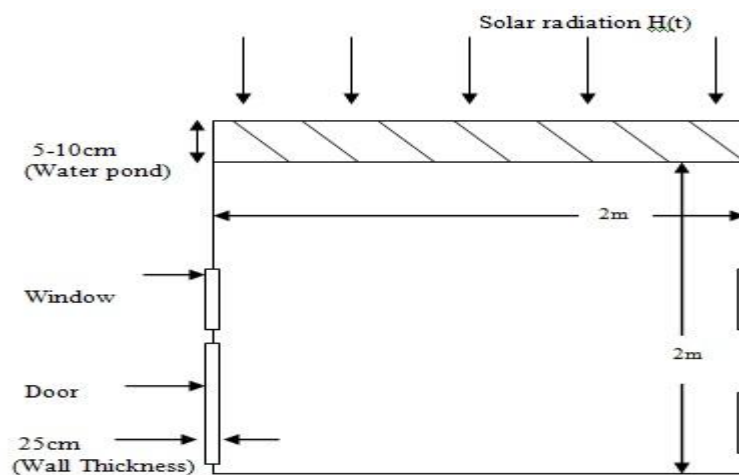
Schematic cross-section of experimental adobe room with water pond on its roof.
